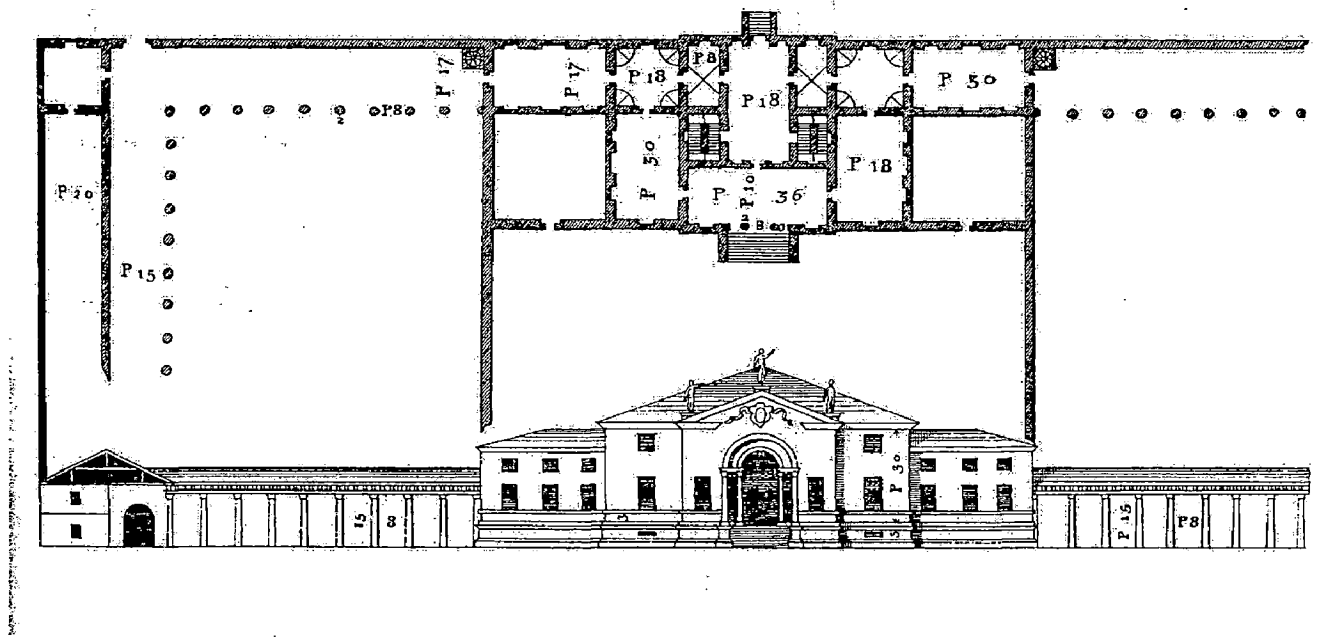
Villa Cavalier Pogliana (or Poiana) at Pogliana in plan and elevation
